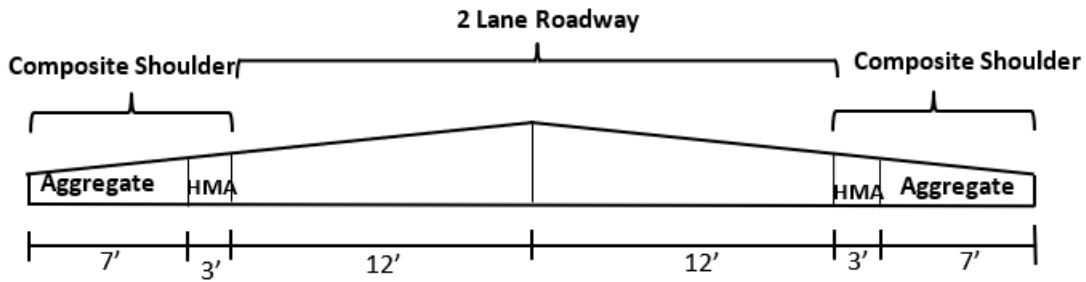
Cross Section of Pavement in Reno County, Segments One and Two
